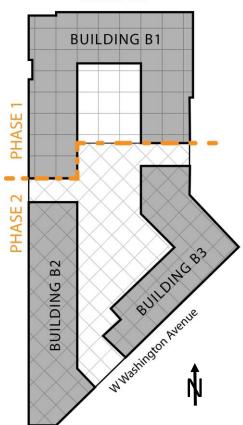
The breakdown of the development's building masses and under-building parking by construction phase.
